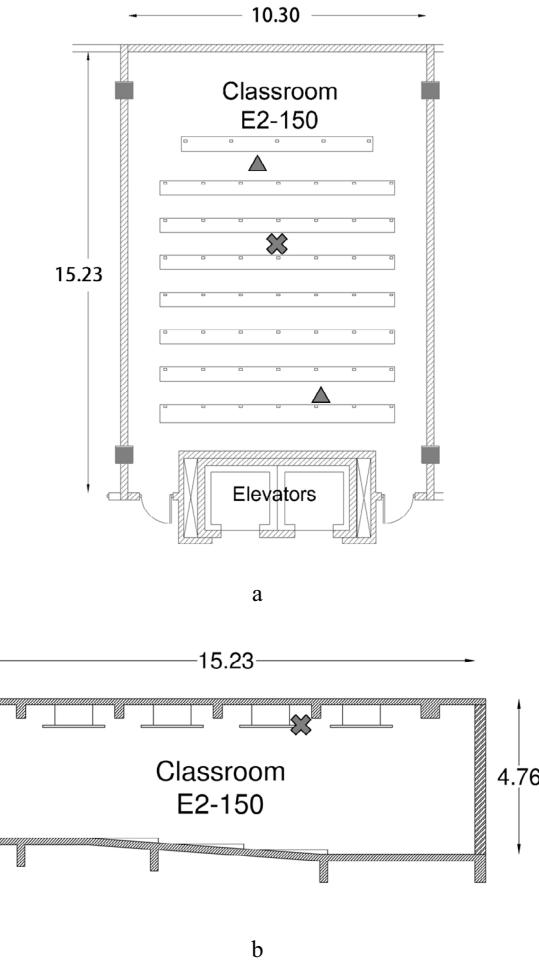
Case-study classroom dimensions (a) plan and (b) section.
